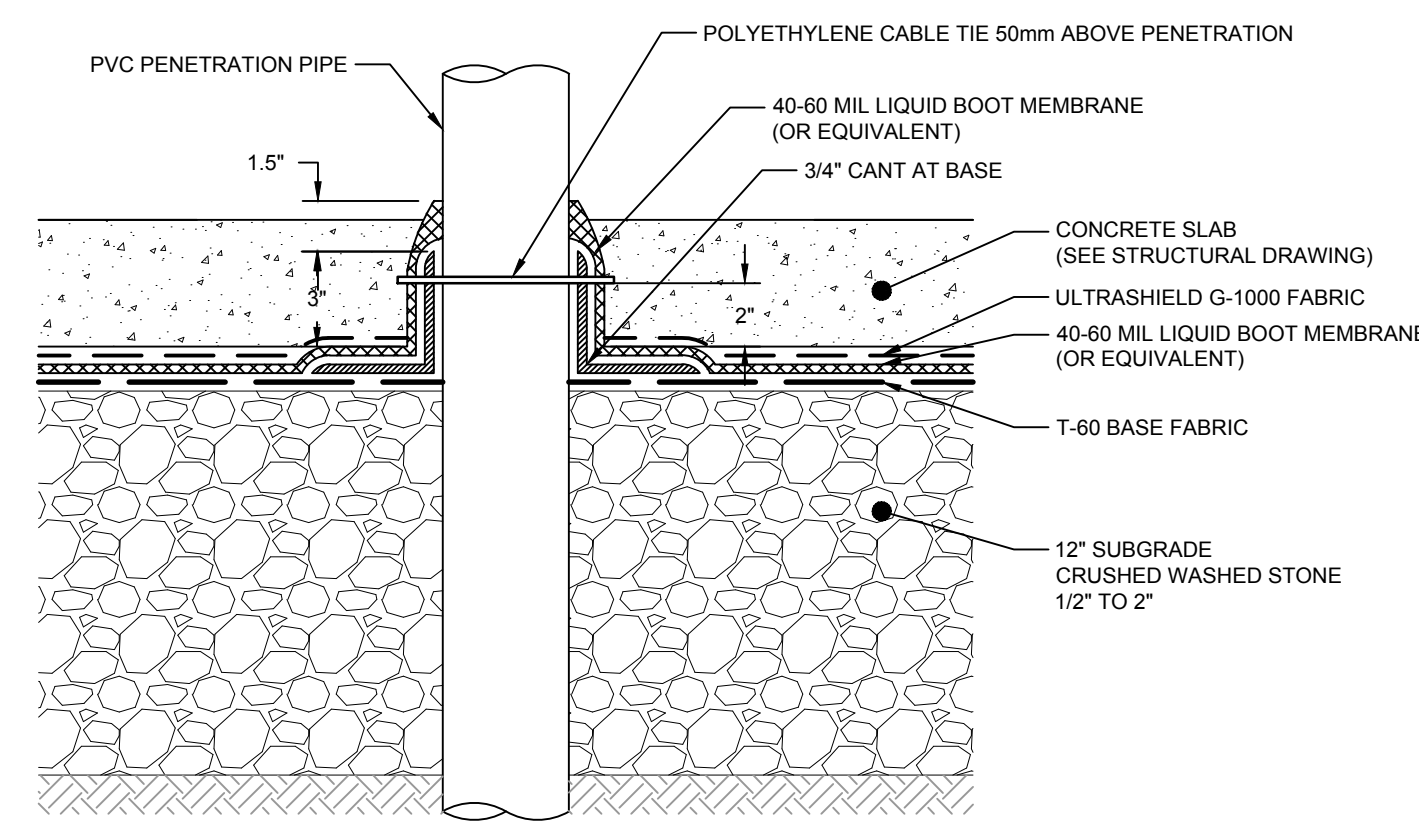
CONCEPTUAL PASSIVE VENT RISER / PIPE / CONDUIT
